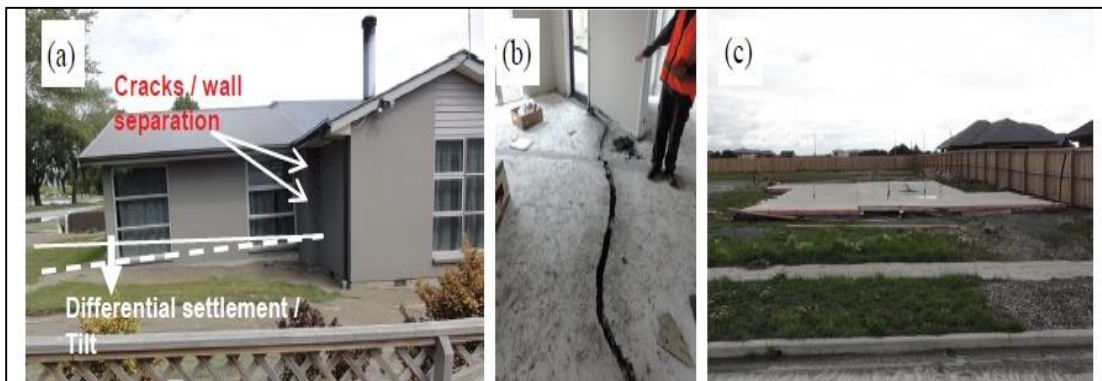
Observed typical liquefaction damage to house foundations: (a) differential settlement resulting in tilt damage to house, (b) large crack in a concrete slab, (c) dishing of concrete slab on grade (Cubrinovski et al. 2012)
